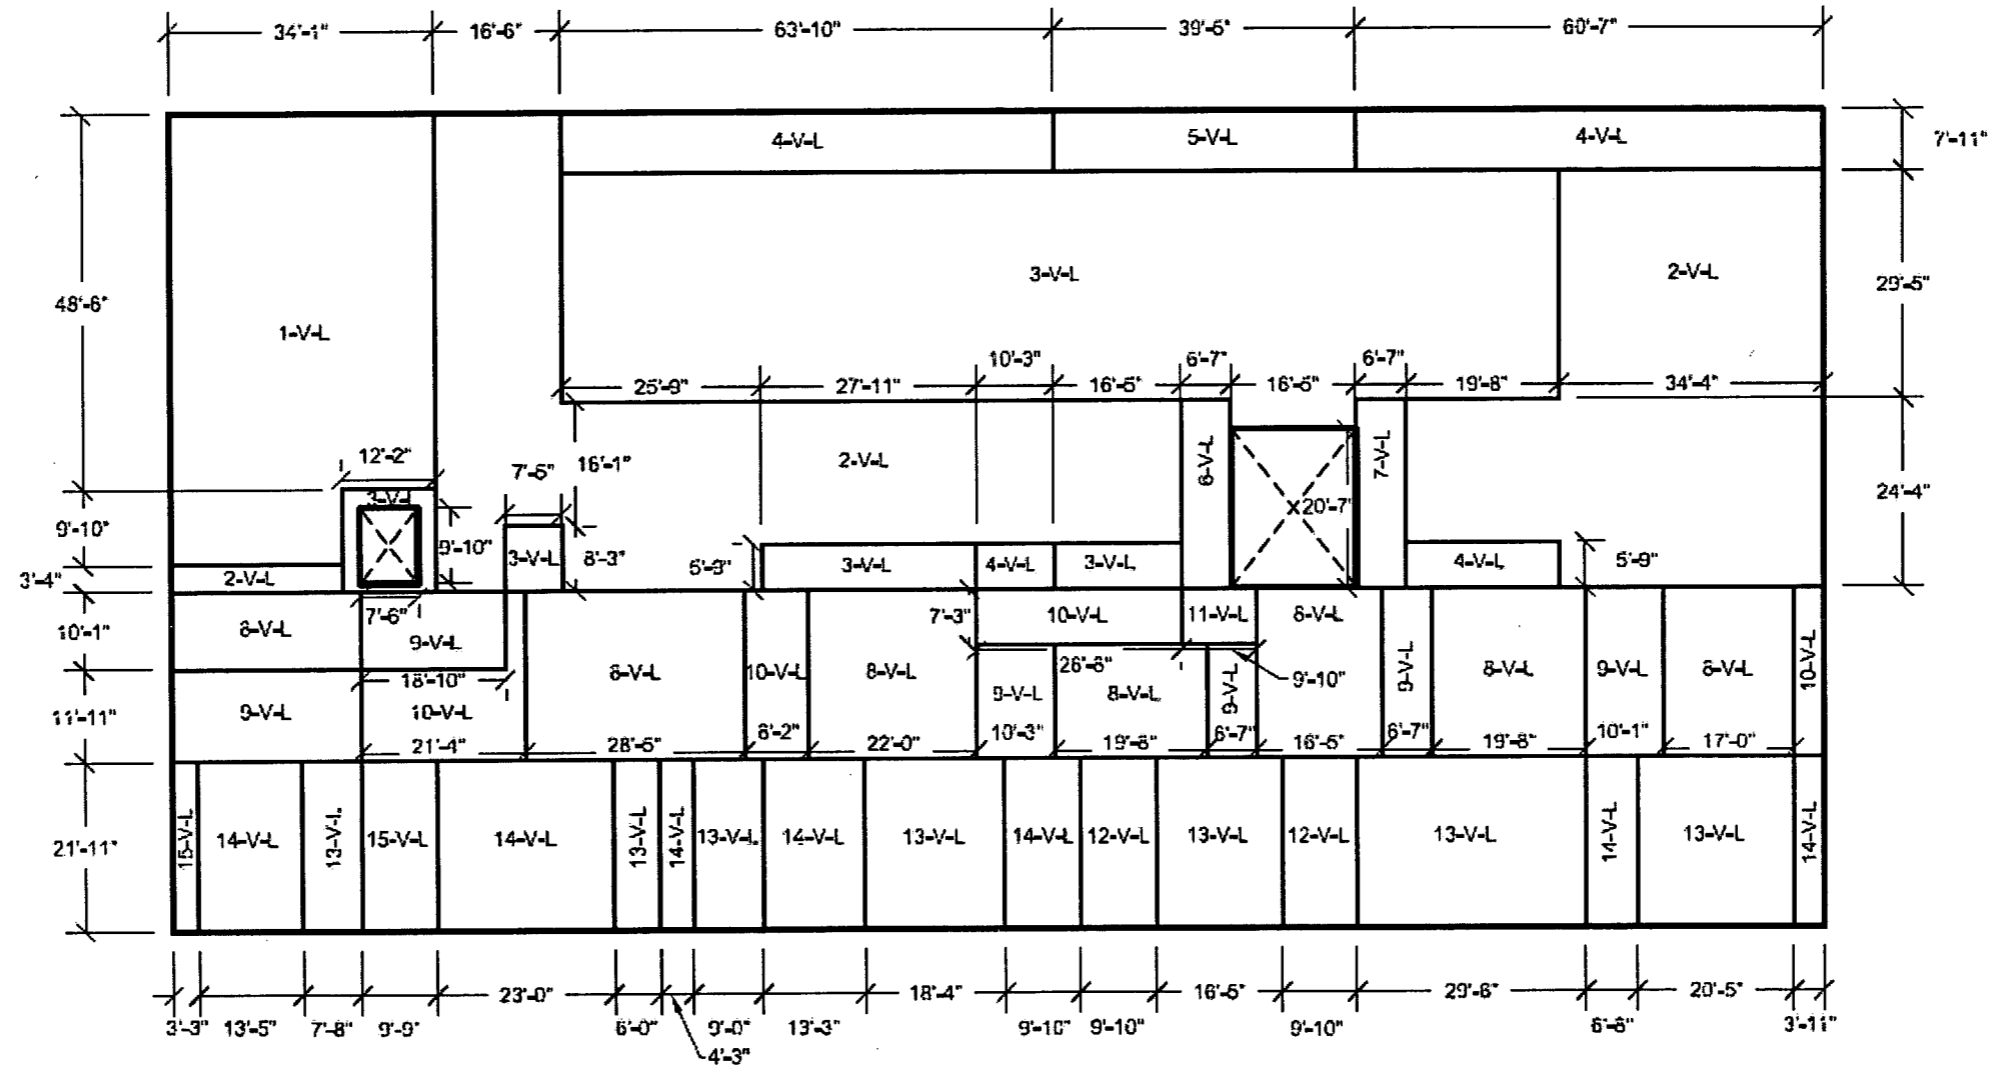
H.3-8: NORTH WALL LOOKING SOUTH
